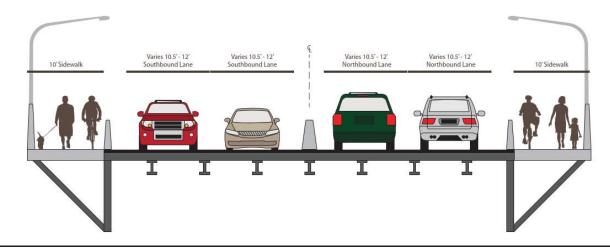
Proposed Typical Section – Warren Avenue Bridge
